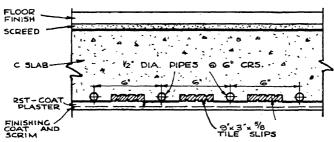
A.—Detail of Embedded Ceiling Panel in Reinforced Concrete Slab.
